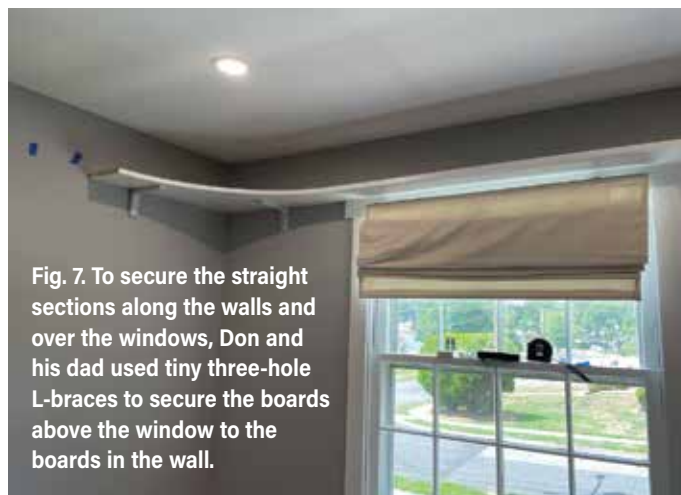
To secure the straight sections along the walls and over the windows, Don and his dad used tiny three-hole L-braces to secure the boards above the window to the boards in the wall.
